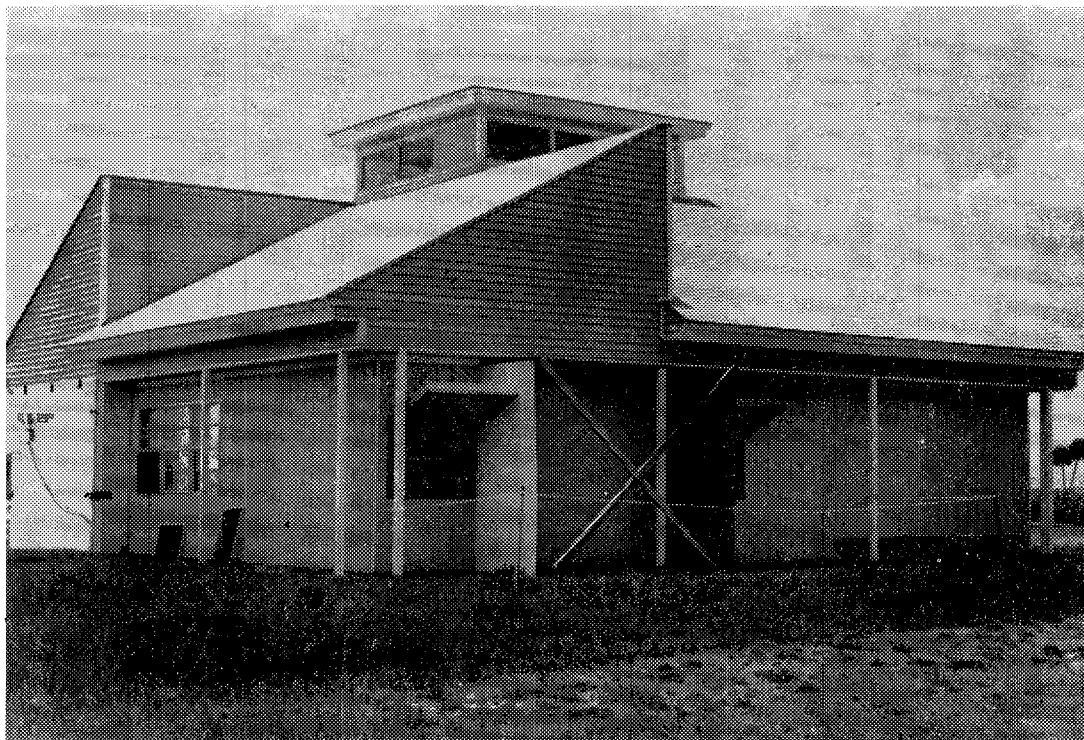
Southeast View of PCL Showing Wing Walls and Overhang Over the Two Windows in the East Wall
